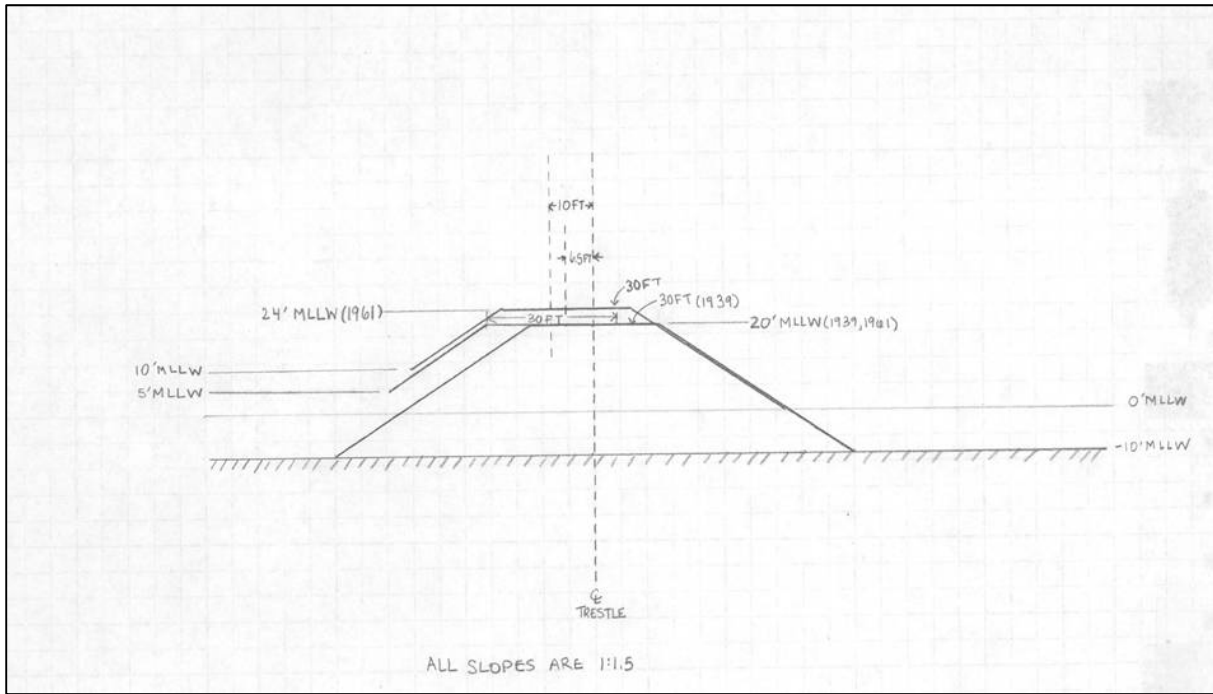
149. Jetty A Cross Section Templates - 61 to 68 and 76+50 to 78 - Trunk
